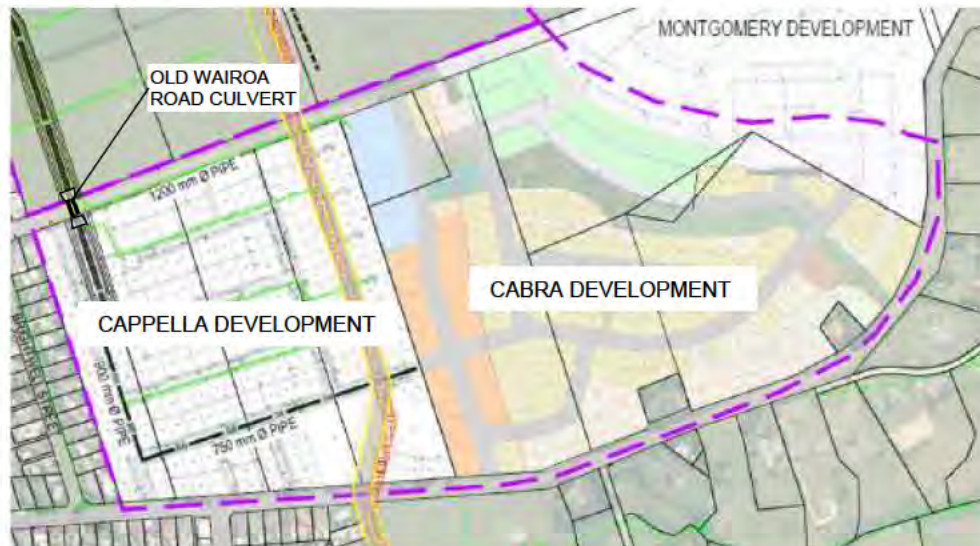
Old Wairoa Road Culvert location plan (Drawing 51-3217404-C310)
